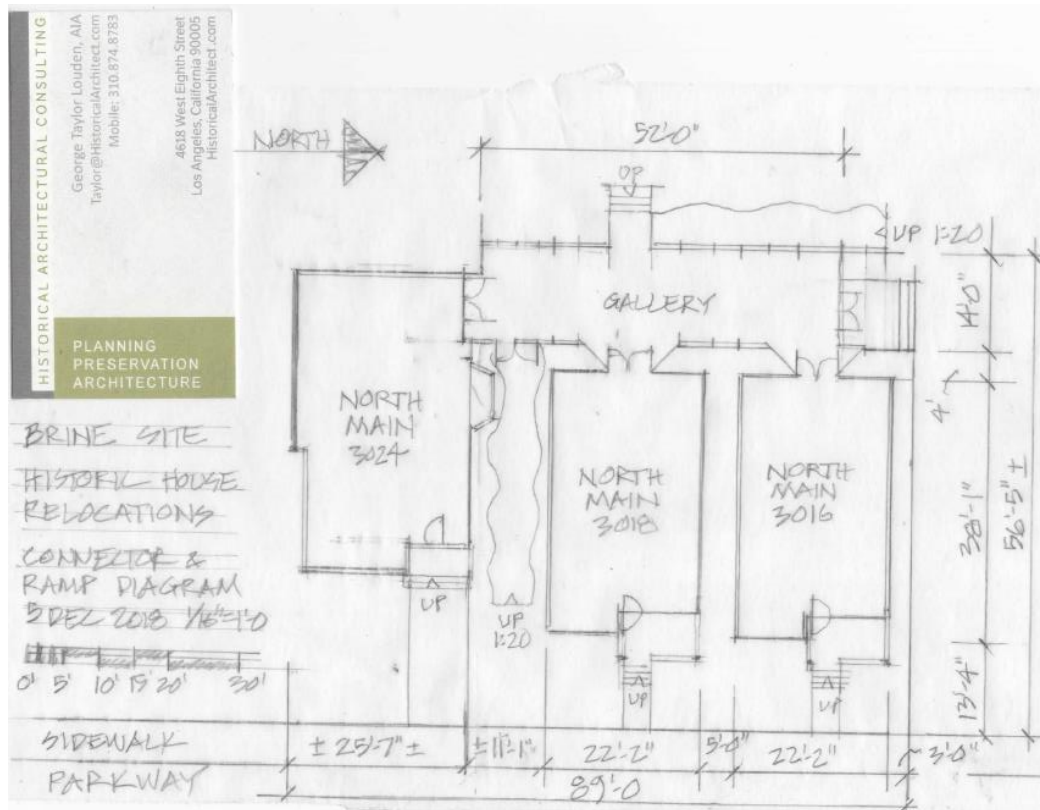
Schematic site plan, proposed connecting structure, 12-05-2018
